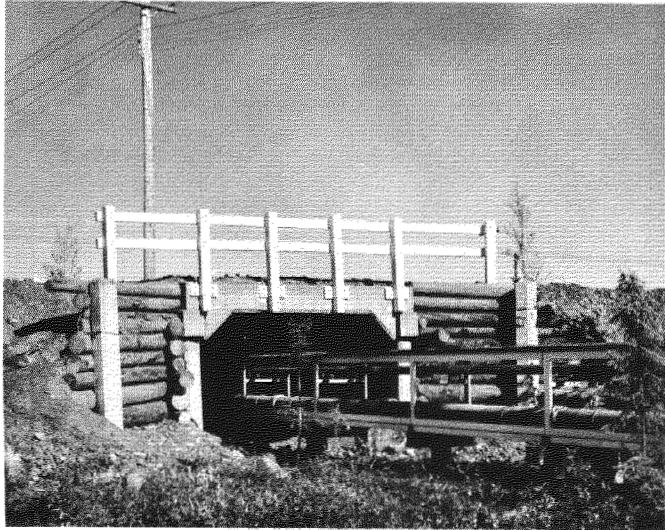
Concrete and wood piling for bridge and utilidor foundations
